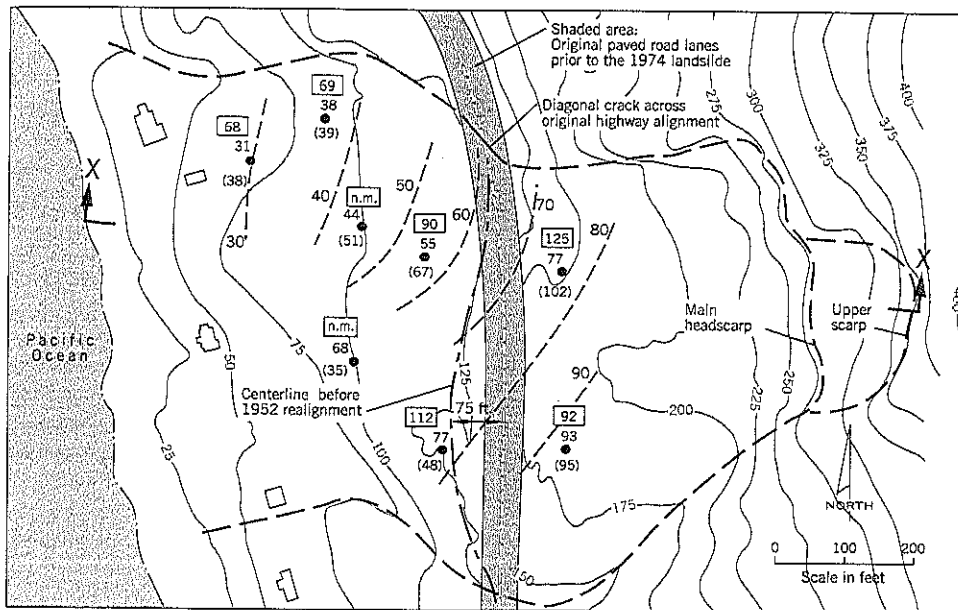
Silver Point Slide. Site plan showing ground contours after the February 1974 landslide.
